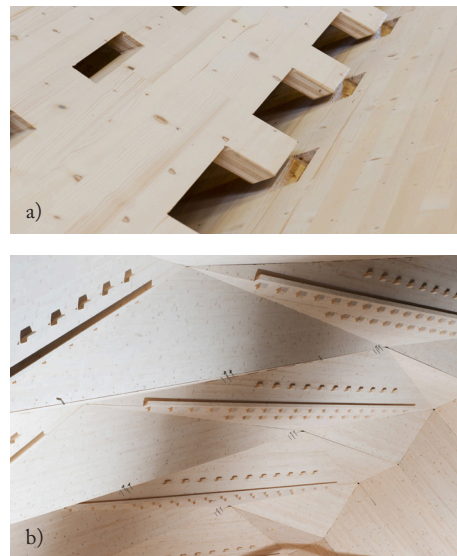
Structure details of Vidy Theater (EPFL, 2020) b. Assembly the roof to the building (EPFL, 2020).
